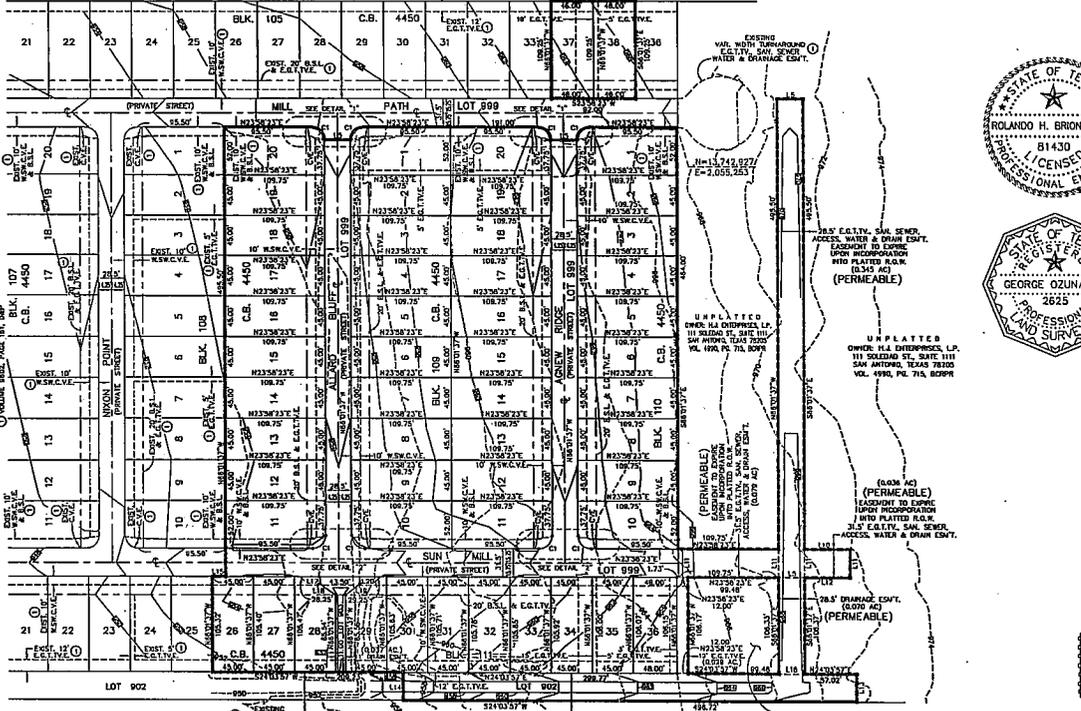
' ALLARD BLUFF & AGNEW RIDGE SCALE 1" = 50'
